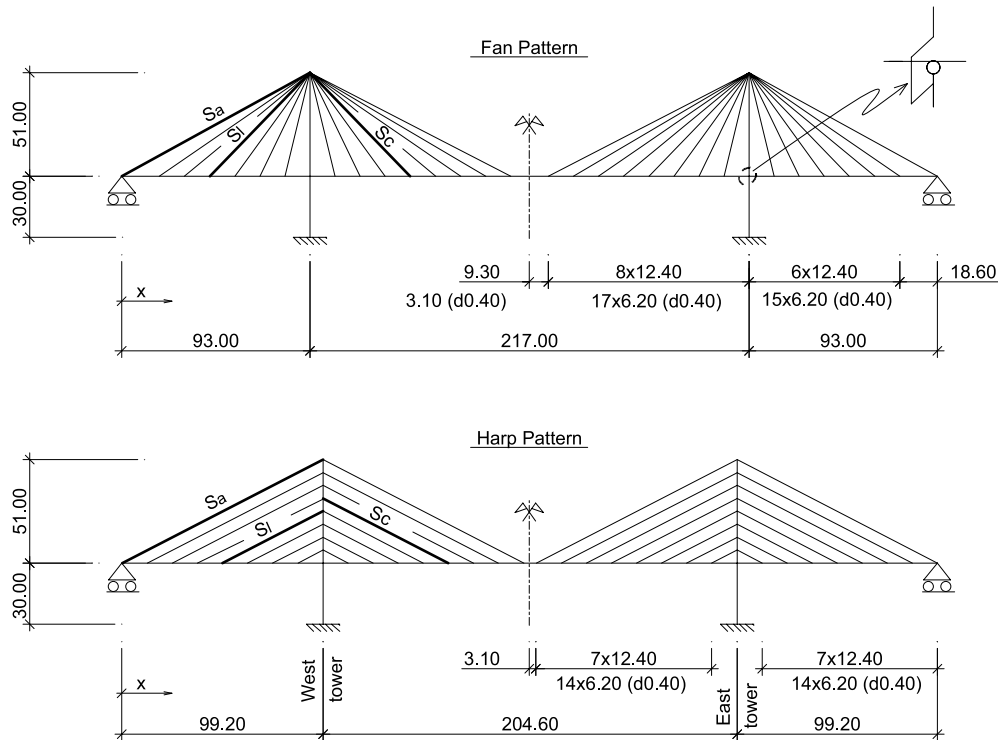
Longitudinal layout of the bridges and location of the anchor stay studied, S_a , lateral span stay studied, S_l , and central span stay studied, S_c . Dimensions in meters.
